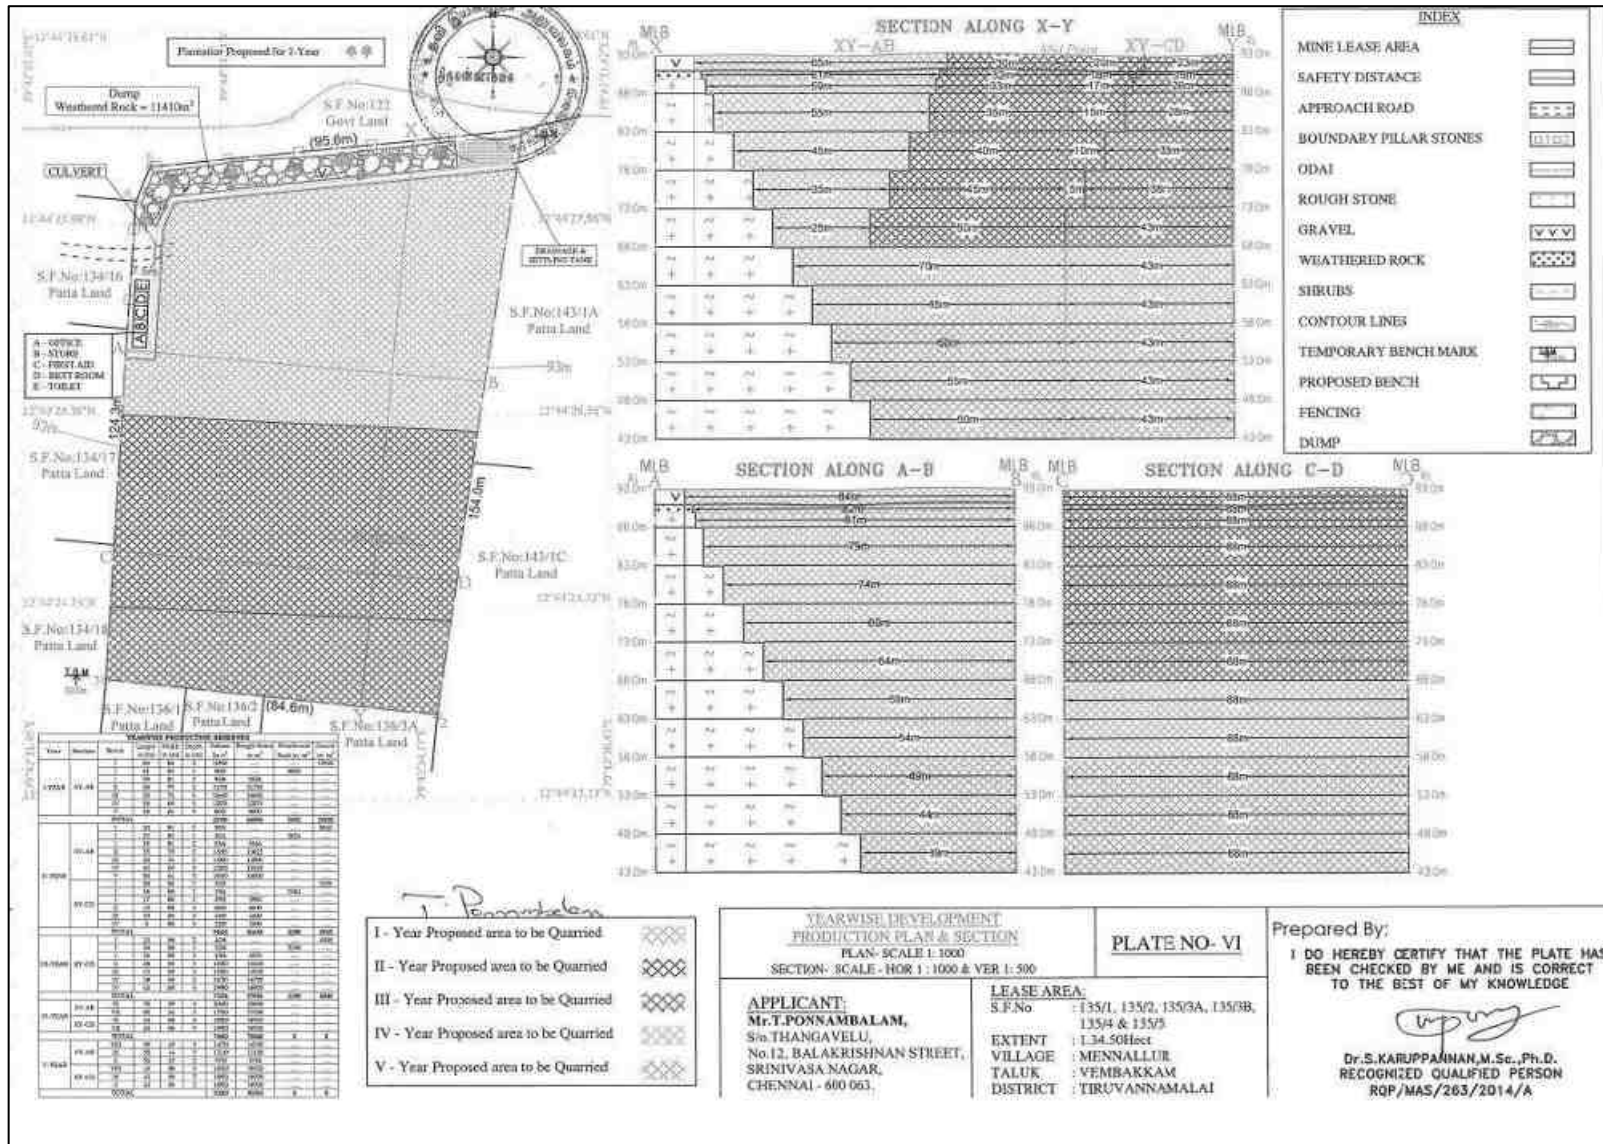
YEARWISE DEVELOPMENT PRODUCTION PLAN & SECTION
